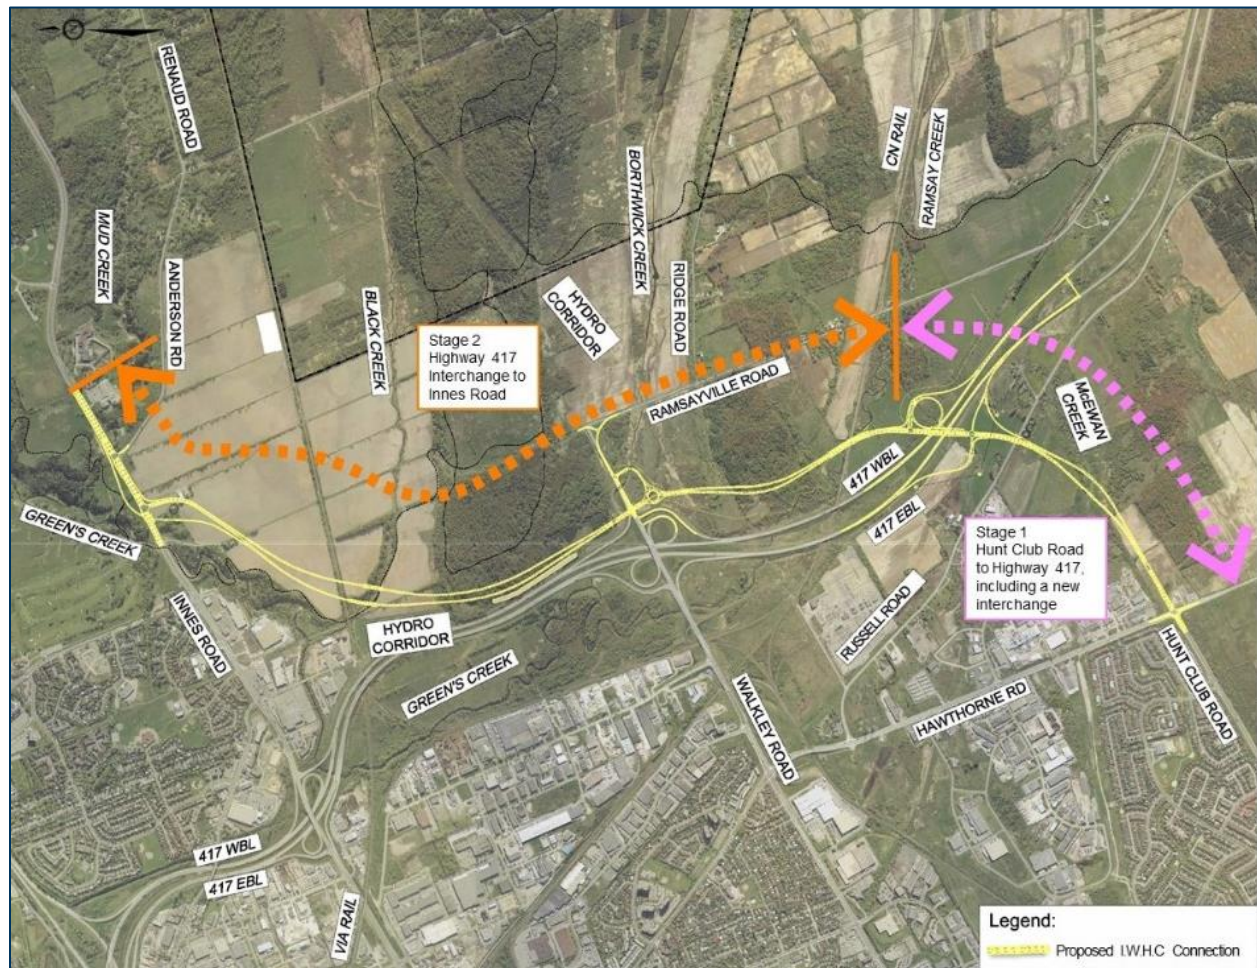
Recommended Plan for Innes-Walkley-Hunt Club Connection (2008)
